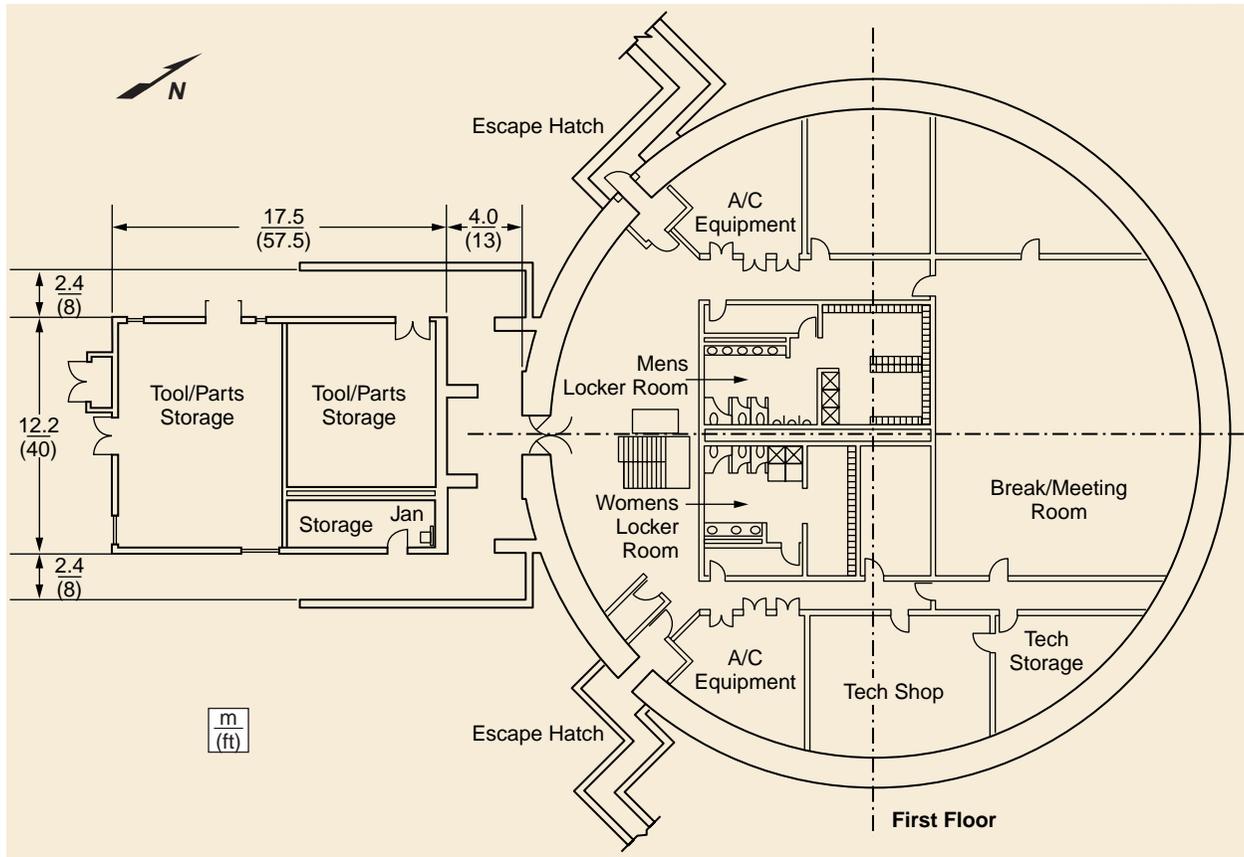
Space Launch Complex 37 Common Support Building (CSB) Sample Layout
